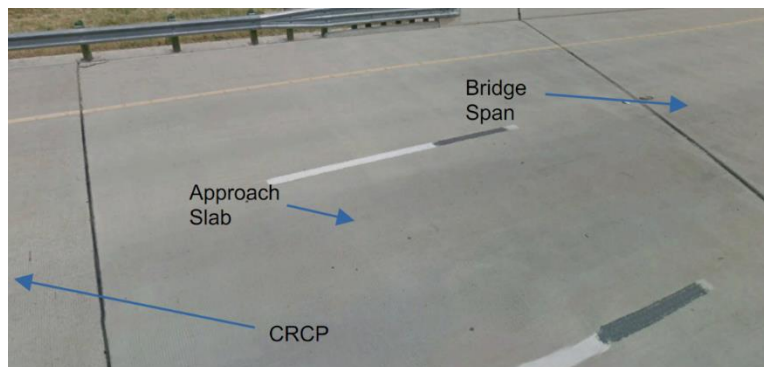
Expansion joints between bridge, approach slab and pavement (Beer, 2021).
